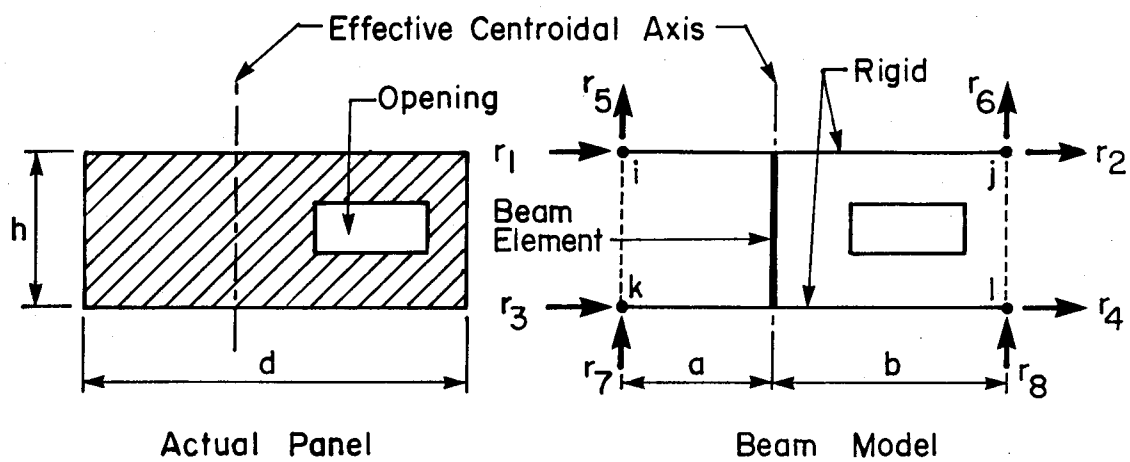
Structural Modeling of Monolithic Coupled Wall Systems
